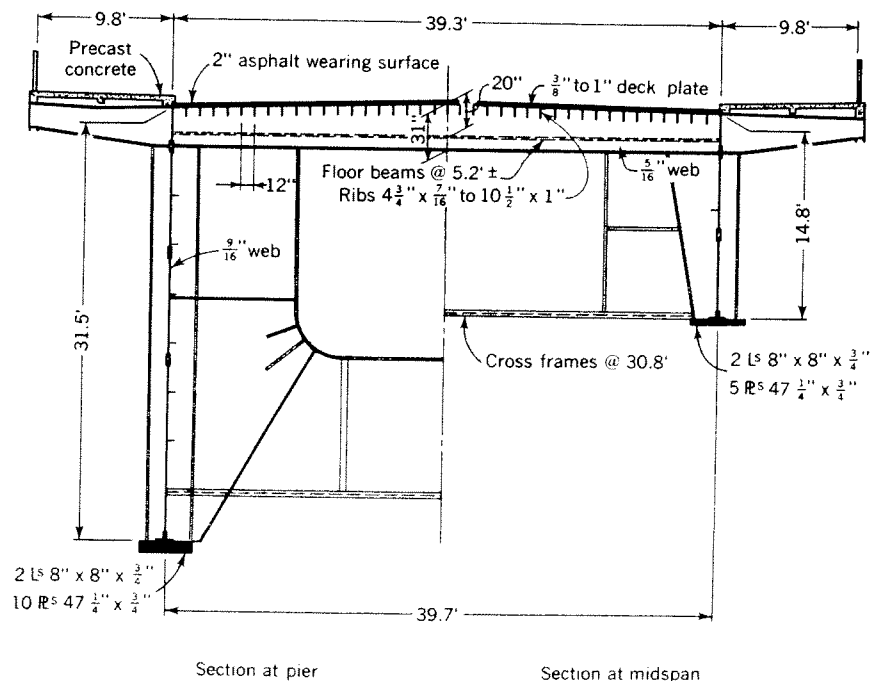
Save River Bridge in Belgrade, Yugoslavia (1956) (spans 246-856-246 ft)
